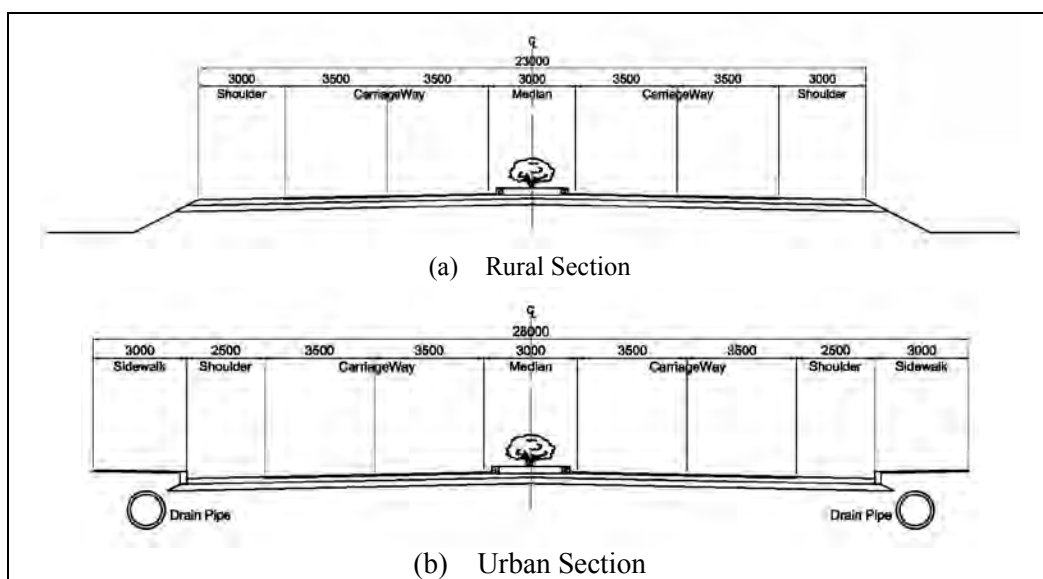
Proposed Typical Cross Section (4 Lanes)
